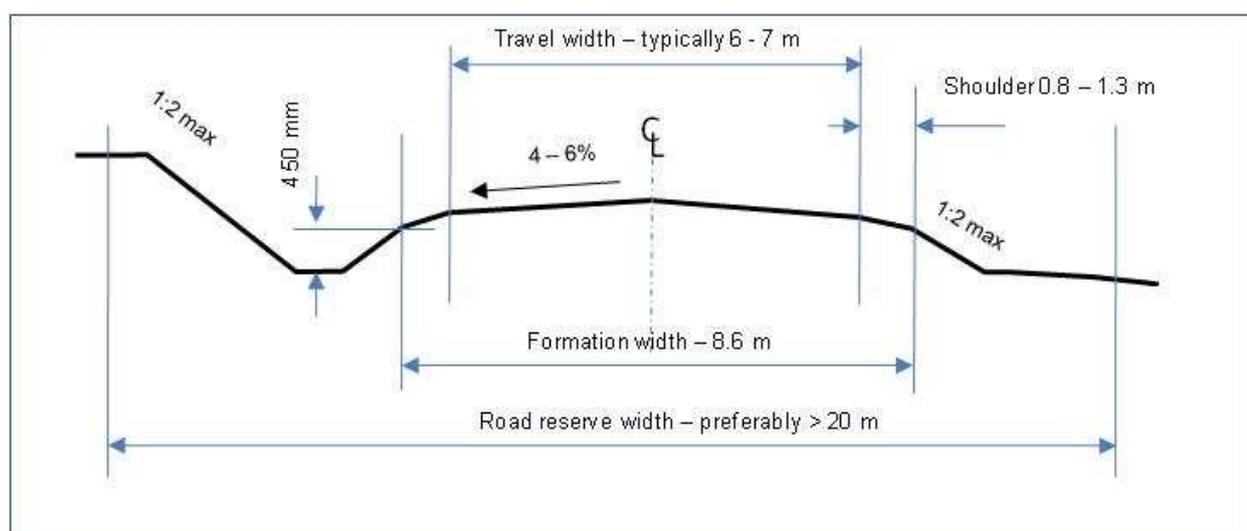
Cross section of a well-constructed gravel road (recreated from Republic of South Africa Department of Transport 2009).
